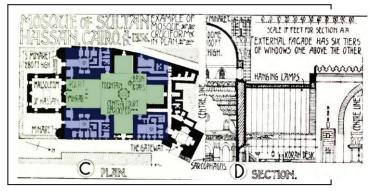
Plan of Madraset El Sultan Hassan, a Mamluk religious building, demonstrating:
